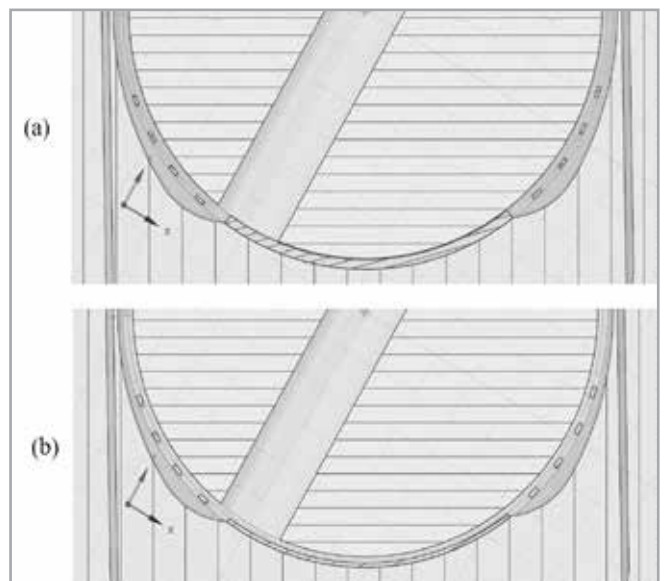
Detail of the lower passage joining the two sides of the bearing. Original bearing (a) compared to the improved design (b).
